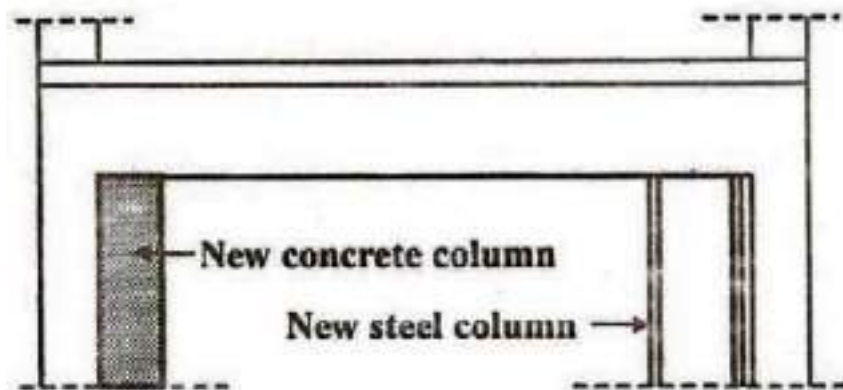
Span shortening technique (Source: Ziara, 2014).
